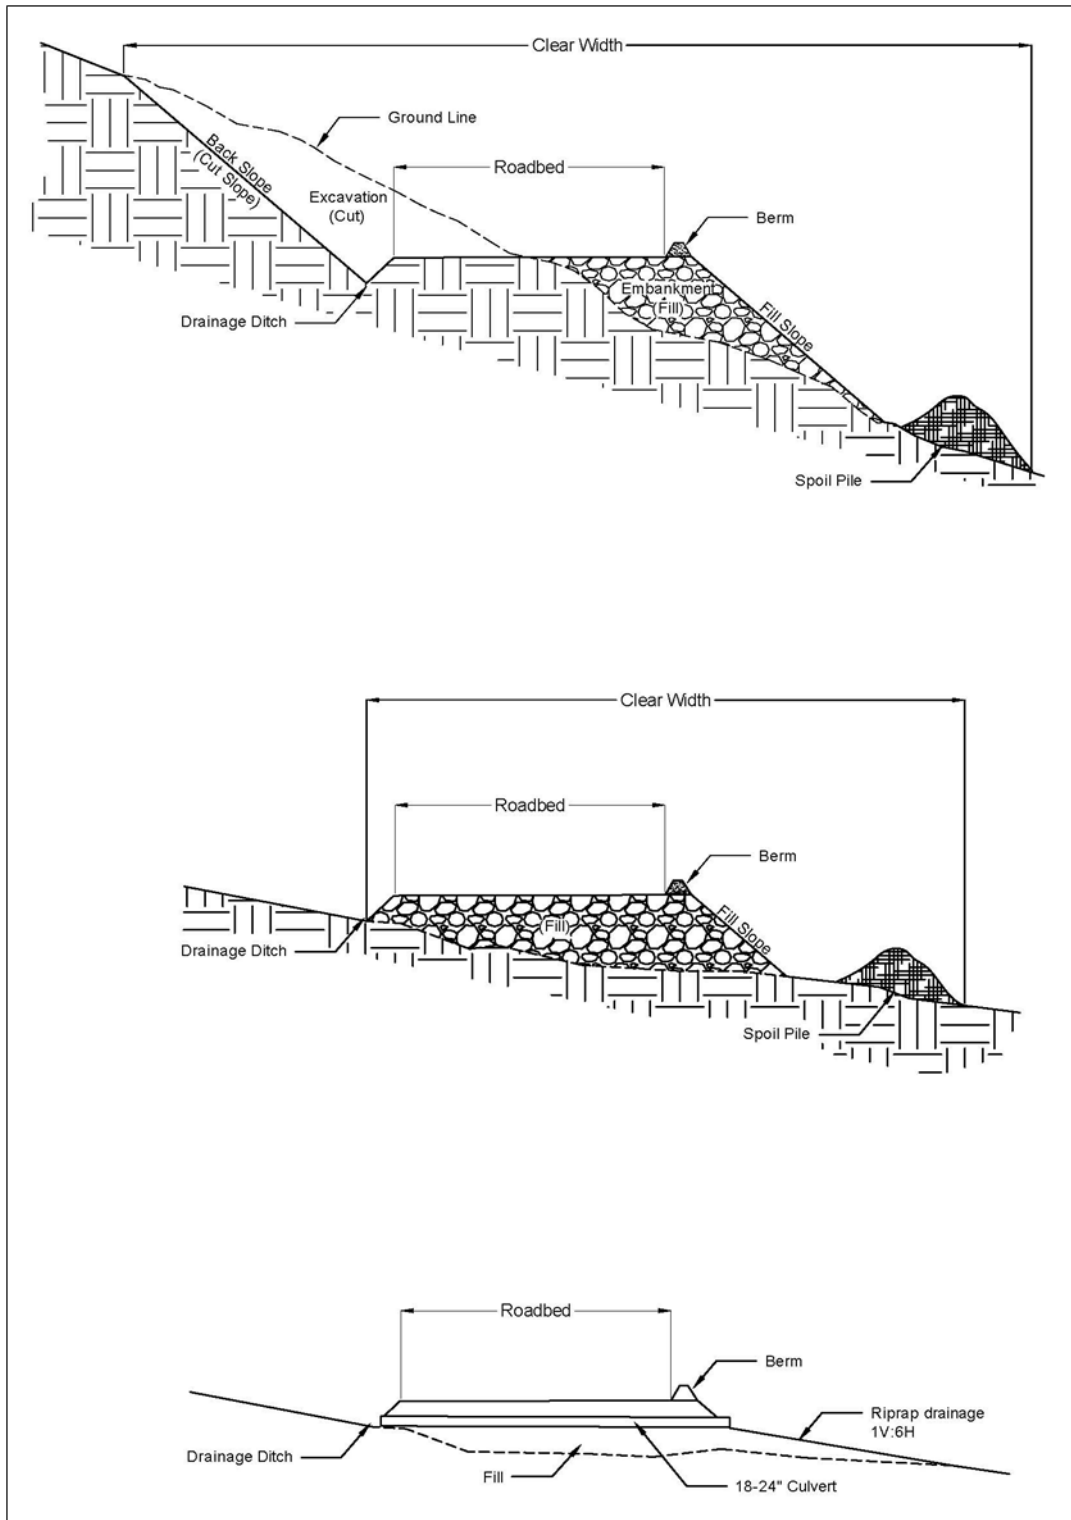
Proposed Korbel Exploration Trail – Typical Construction Profiles
